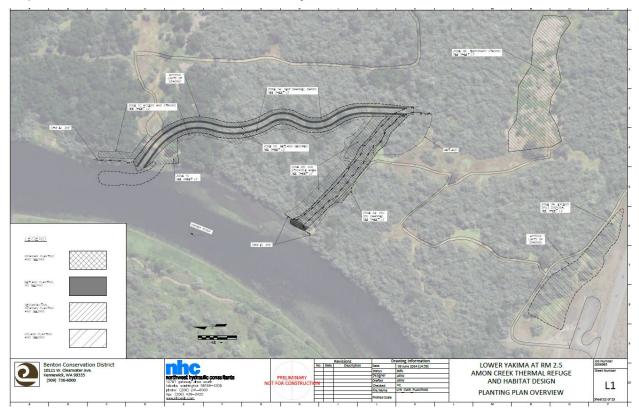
Planting Plan Overview (Northwest Hydraulic Consultants and Benton Conservation District 2024).
